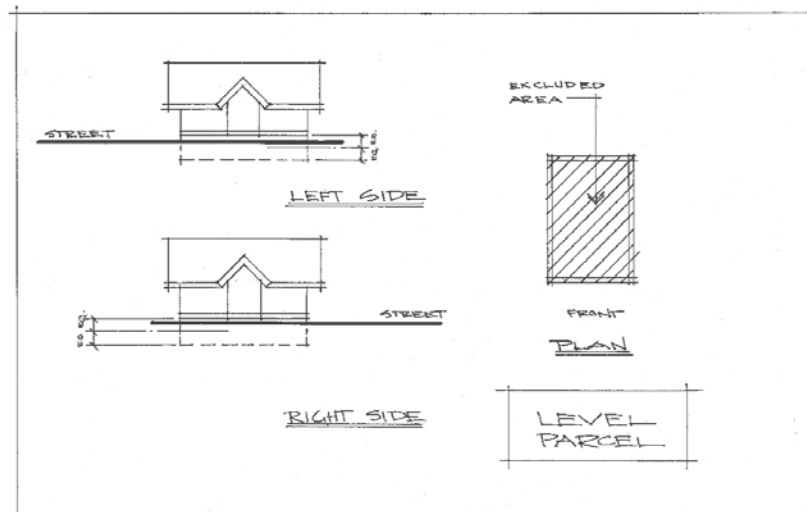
In-Ground Basement Floor Area for a level parcel
